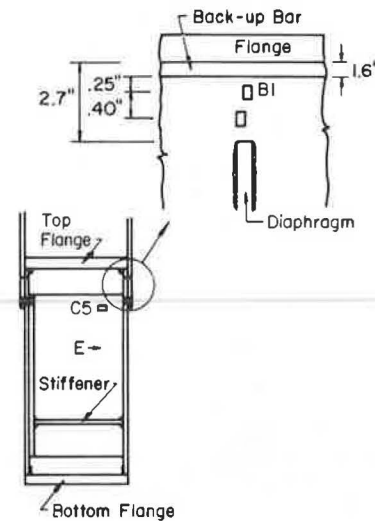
Typical box section and expanded detail, I-79 box girder.
